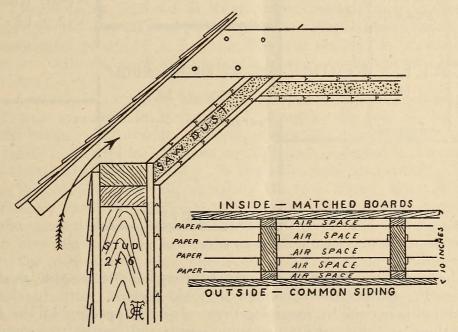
FIG E.—SECTION SHOWING PLAN OF CONSTRUCTION OF WALLS OF DAIRY BUILDING.
